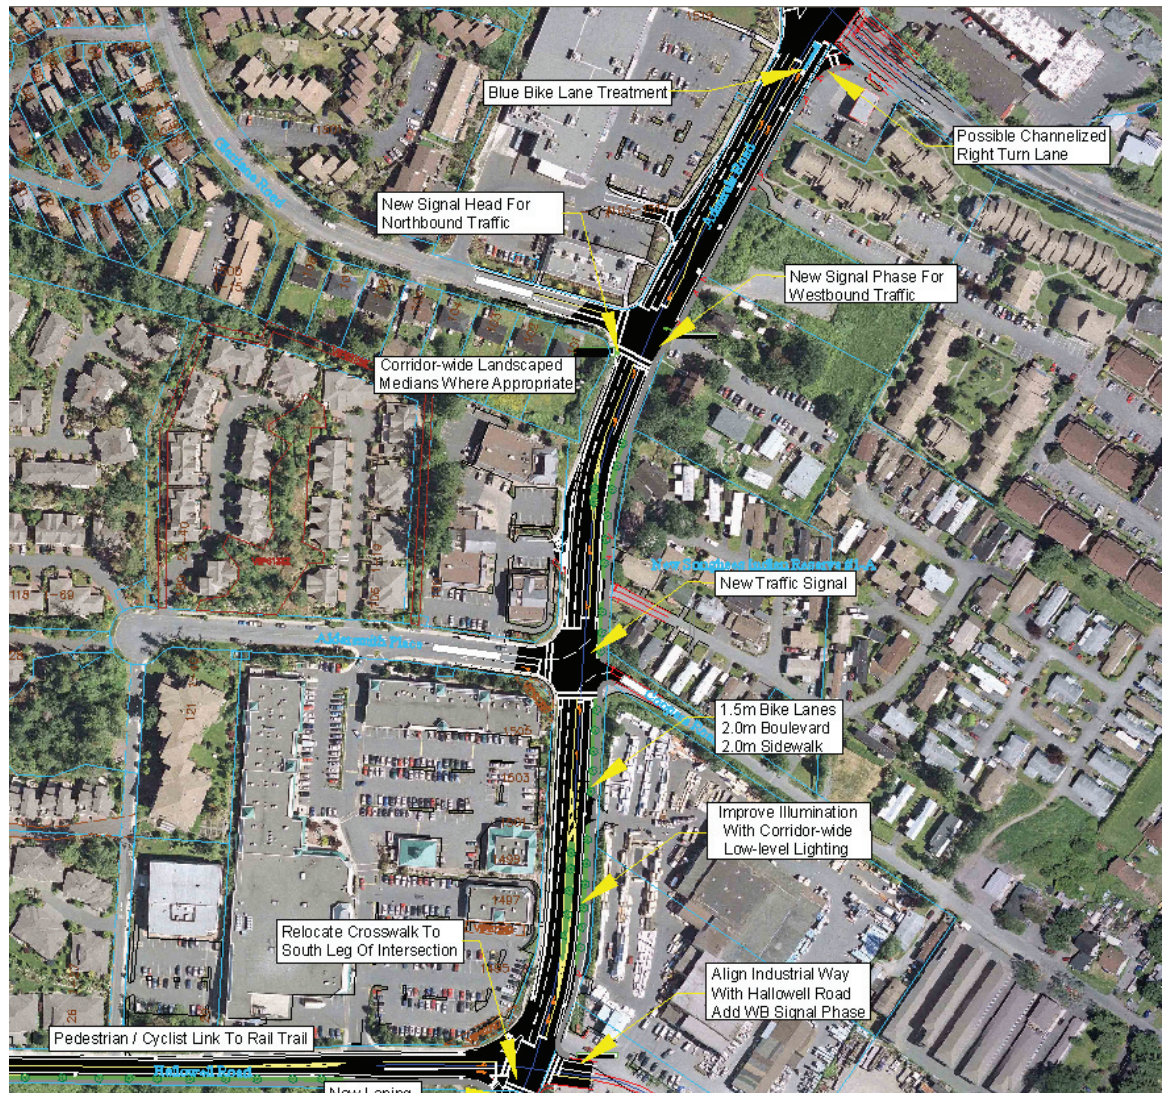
Admirals Road from Island Highway to Hallowell Road
